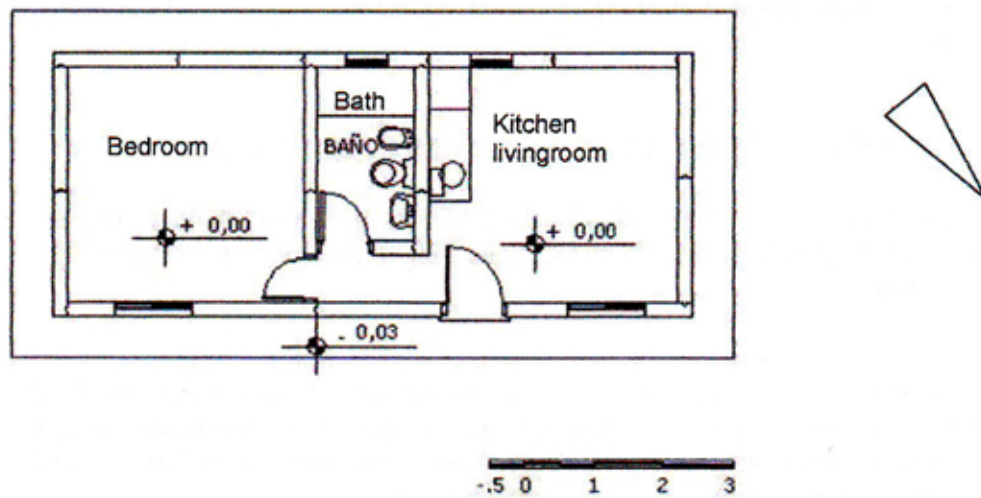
Plan of the prototype house (Patrone, 2006).
